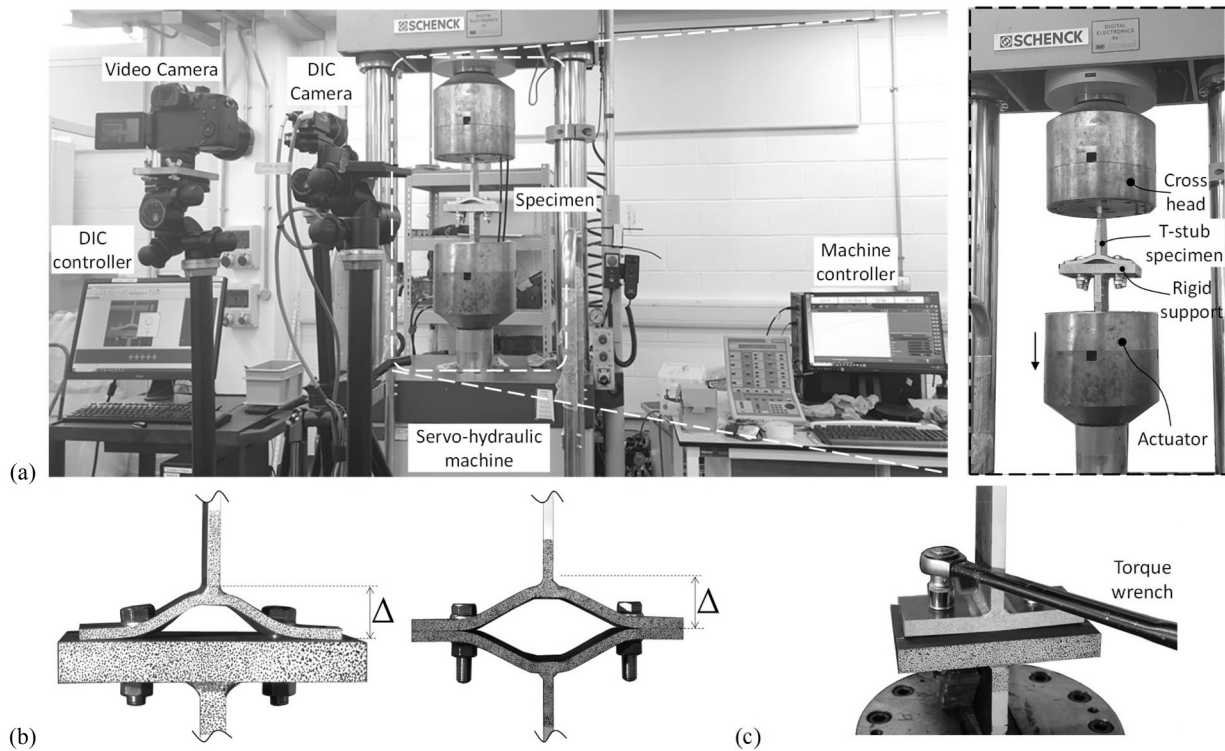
(a) Test setup for T-stub testing; (b) Specimen types and deformation measurement; (c) Bolt tightening with a torque wrench.
